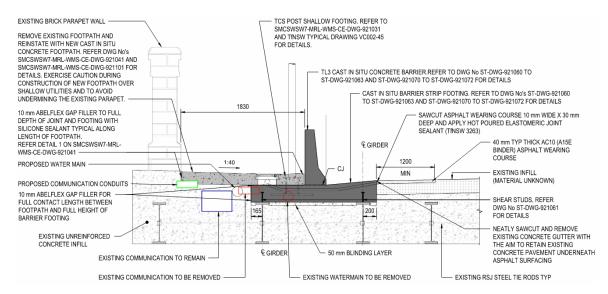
Cross section of the proposed countryside footpath behind type-f barrier
